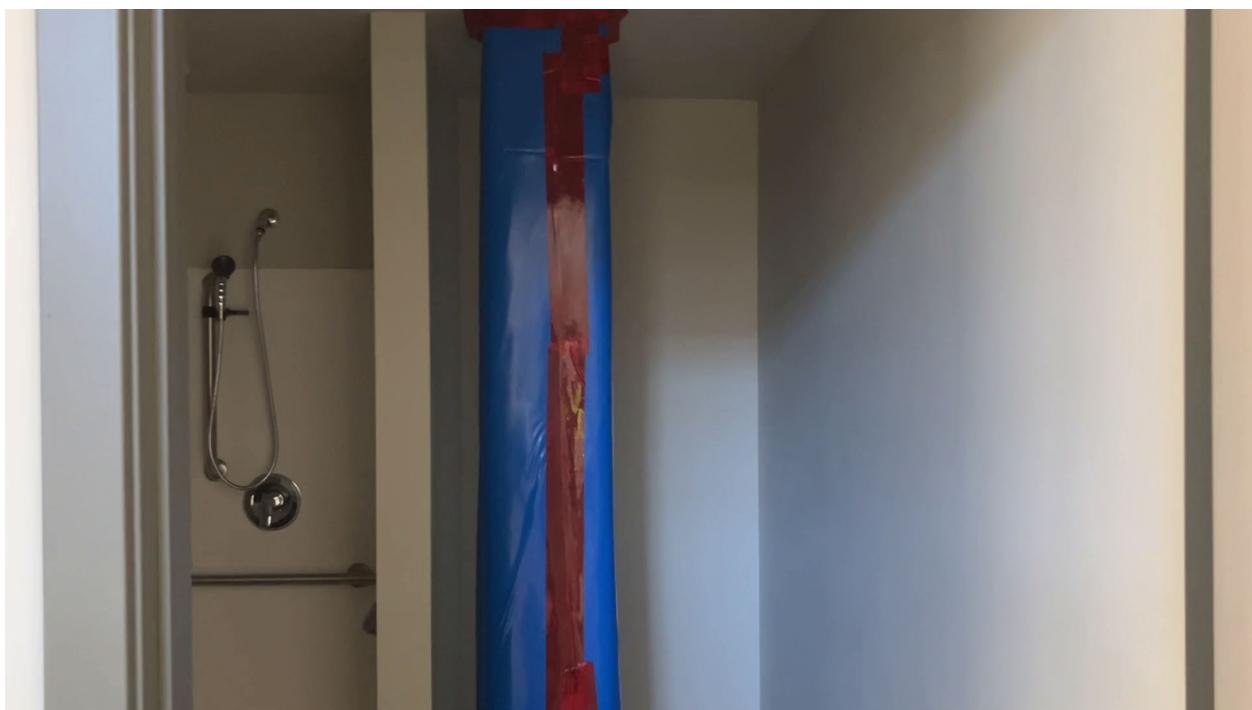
Vapor Barrier Sealed Column located in the bedroom of Unit 1043
